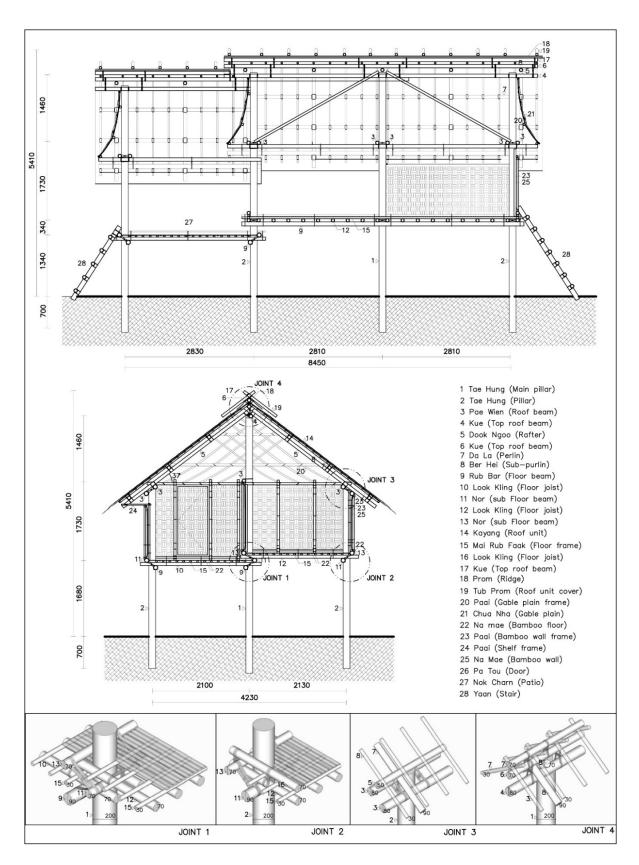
Construction process and joint details of the Moklen ethnic house
